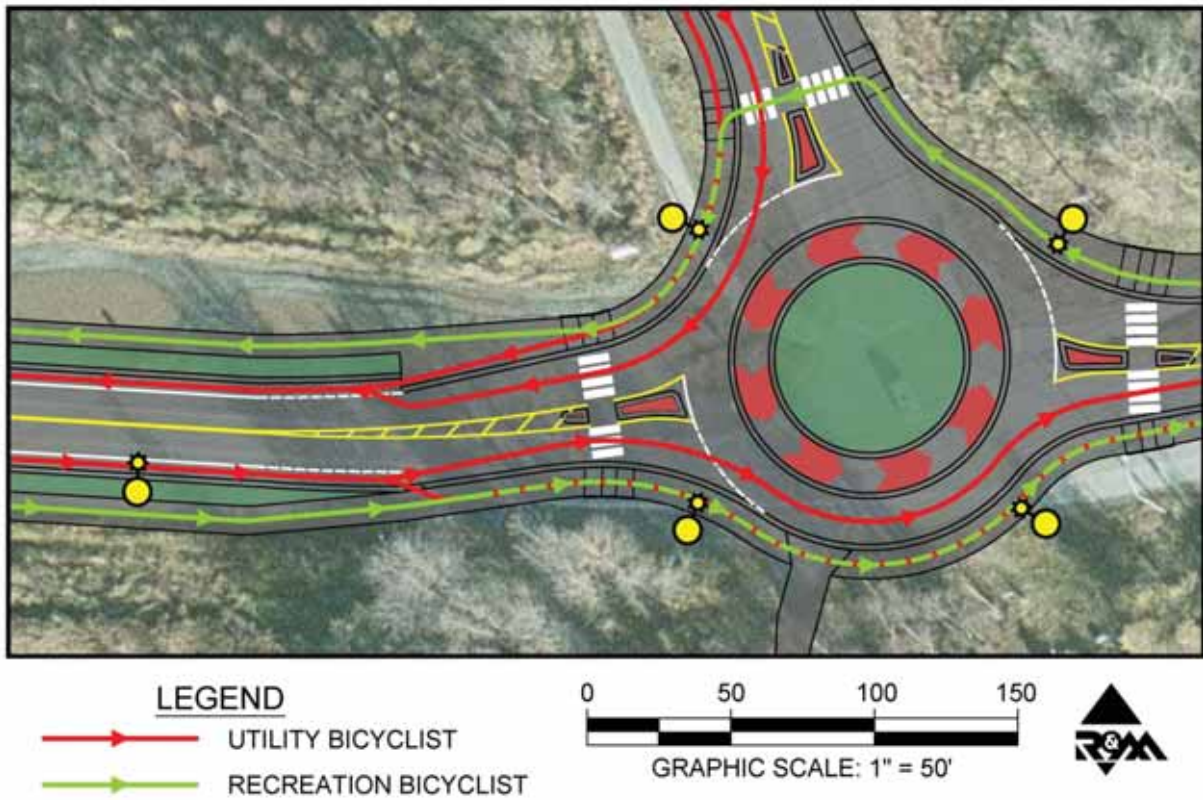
1 On-Street and Off-Street Bicyclists’ Accommodations at Roundabouts
